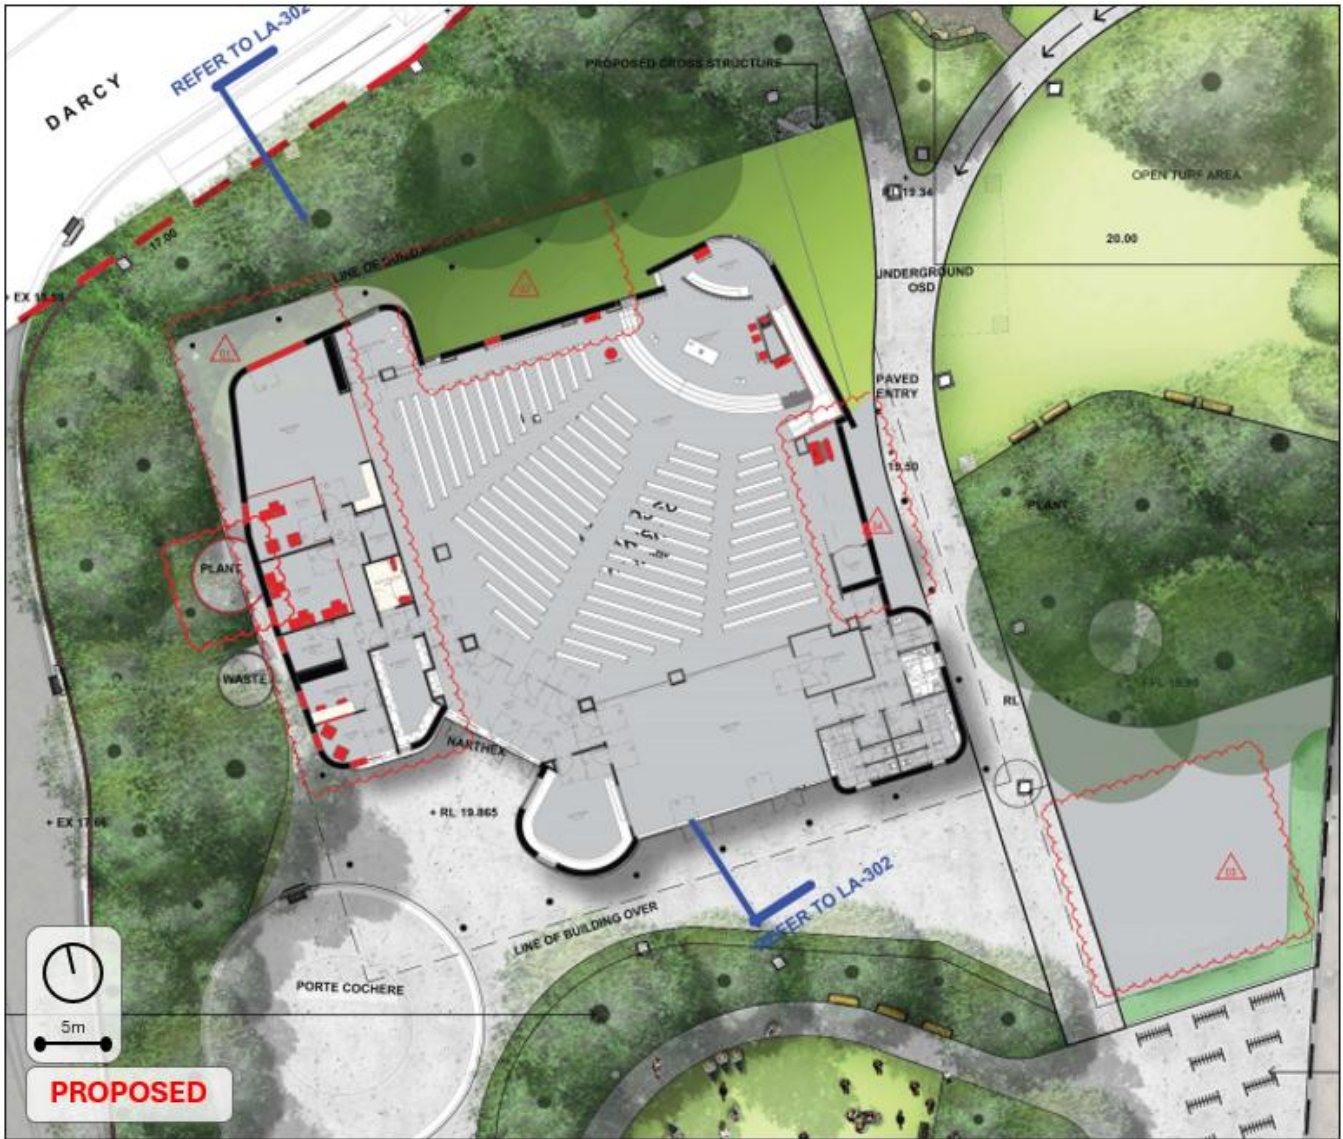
| Proposed Sacred Heart Church (Source: Applicant's Modification Application, 2026)
